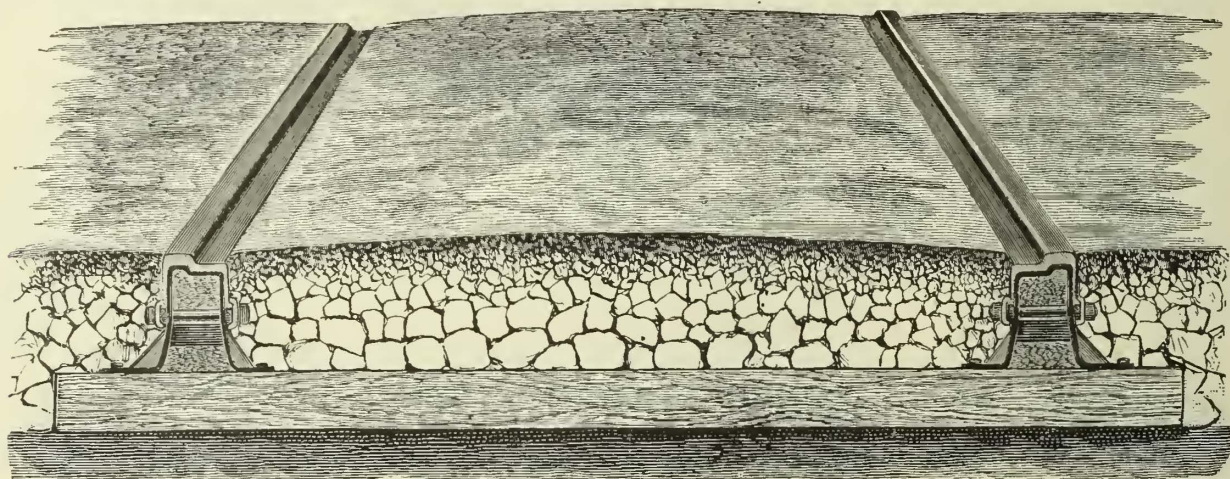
BOX GIRDER RAIL IN MACADAM PAVEMENT.
